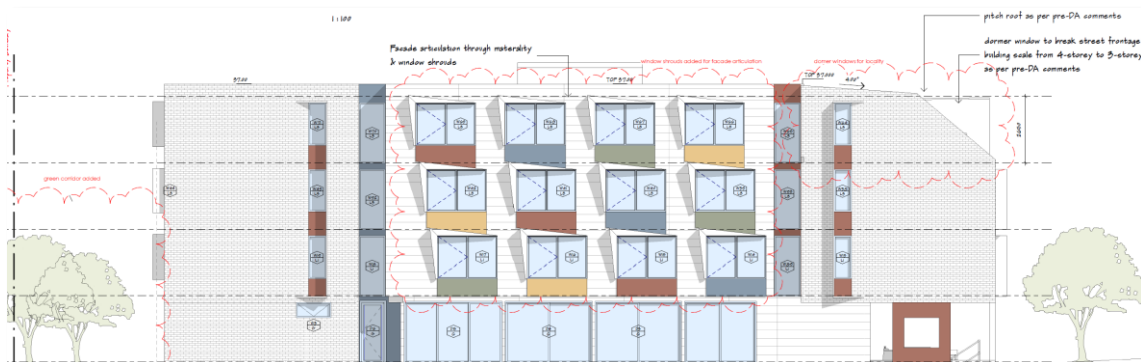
Extract of the East Elevation Drawing of proposed development (Source: Architectural Plans prepared by Level Architects).
